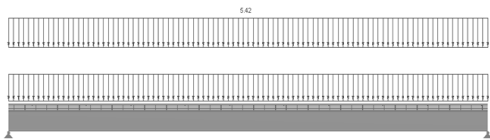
Composite steel and concrete beam with C, permanent and imposed load
